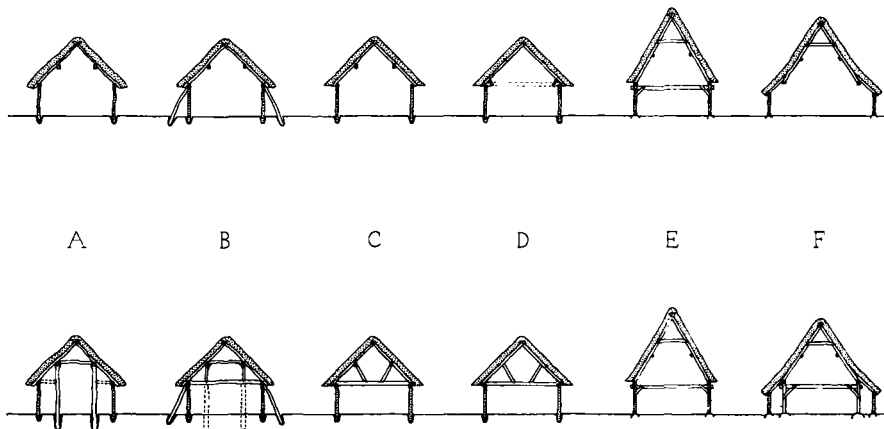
Suggested general development of the house structure in Denmark during the Iron Age, the Viking Age, and the Middle Ages. A: building with *sula* structure. B: building with queenpost-structure. C: building with trussed rafter roof combined with purlins. D: building with trussed rafter roof. E: timberframed building with collar rafter roof. F: timberframed building with collar rafter roof and outshorts (*højremhouse* related to the Saxon house). Sections (top), trusses (bottom), scale about 1:500. H.S. 1984.
